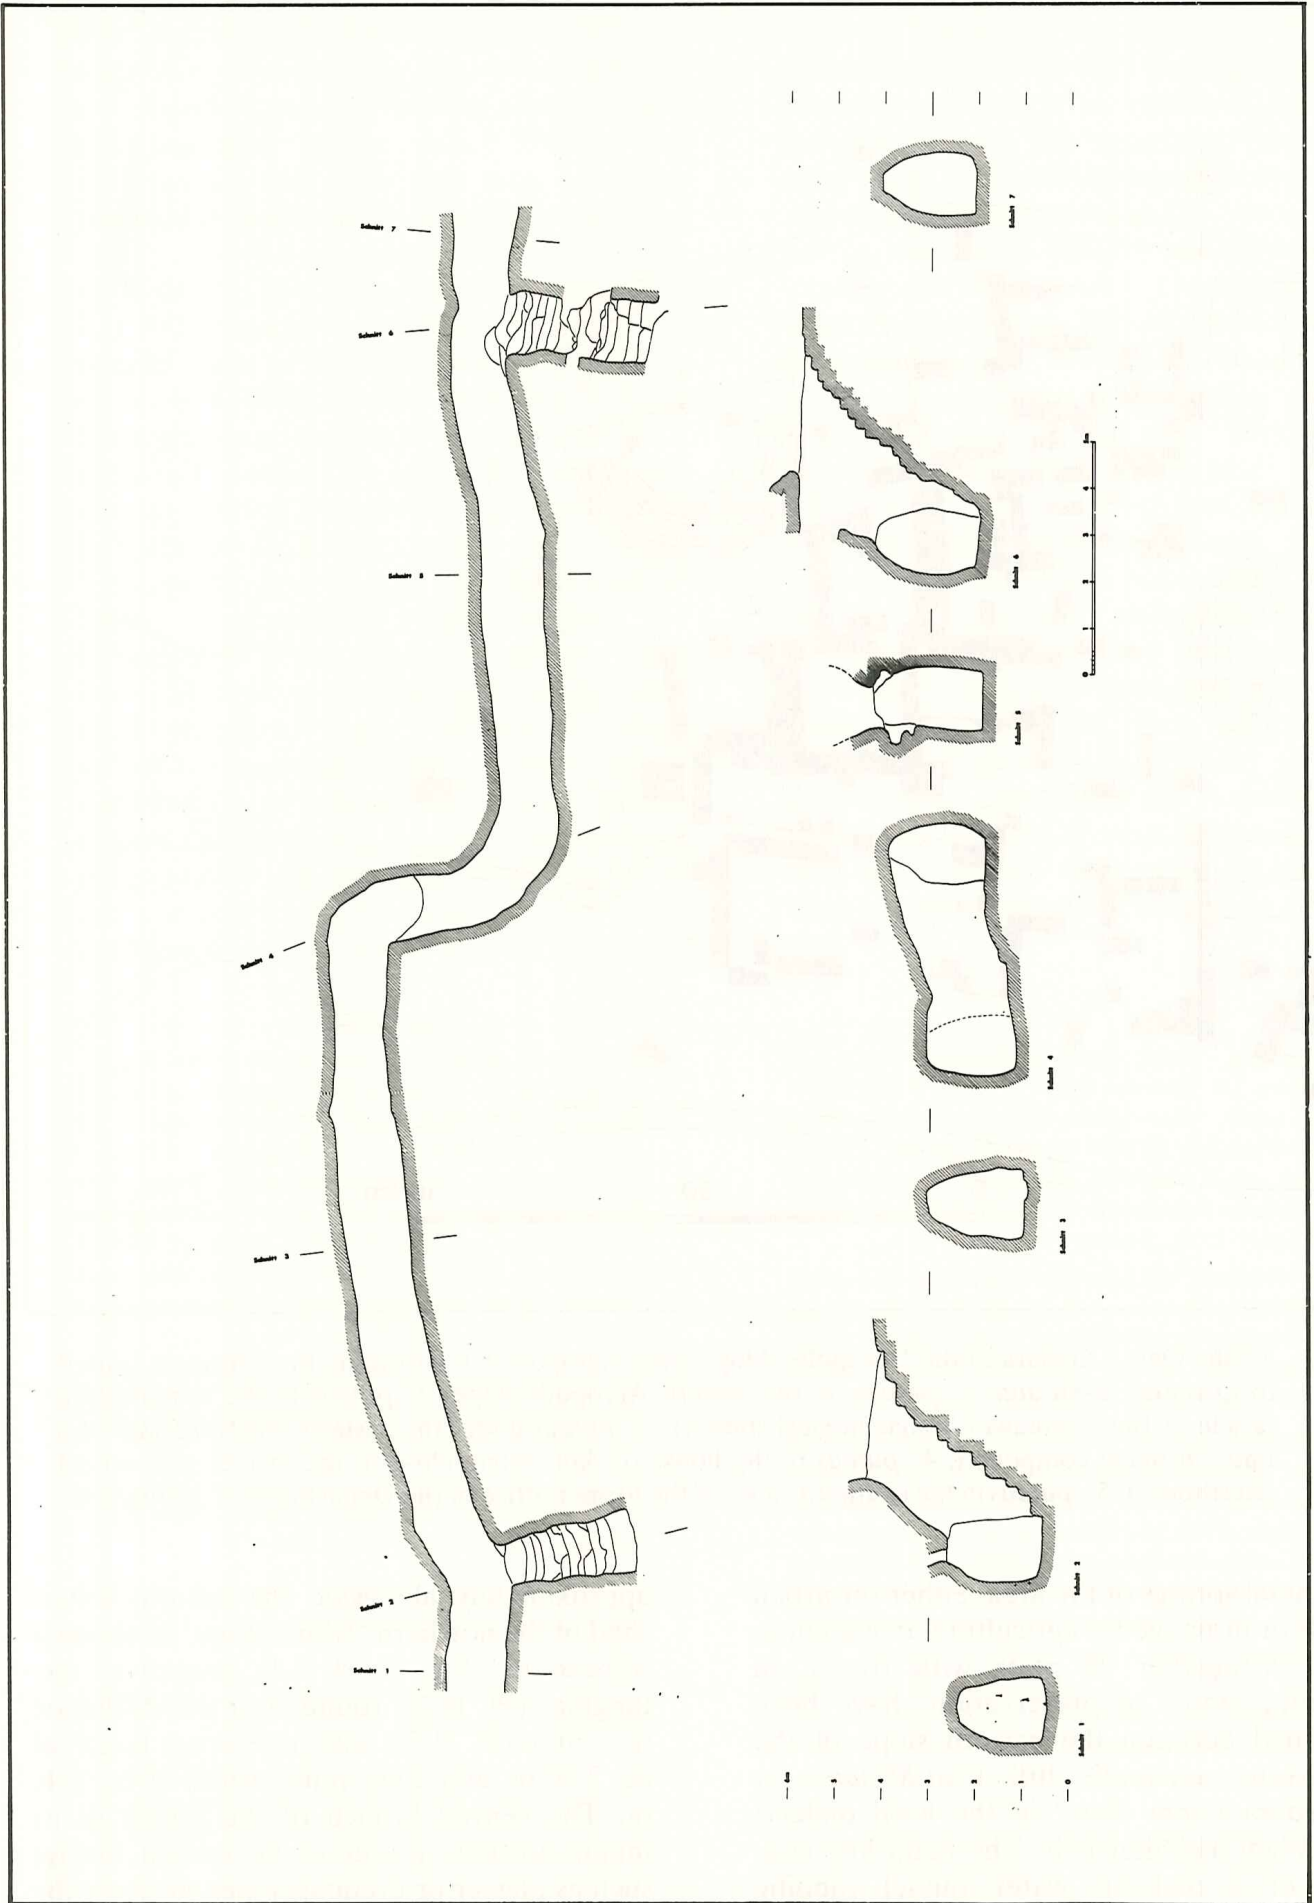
Qanawat al-Fir'aun, Findspot 17: Ground plan and sections of the underground rock-cut tunnel (drawing by K. DaCosta and F.-J. Reidel).
